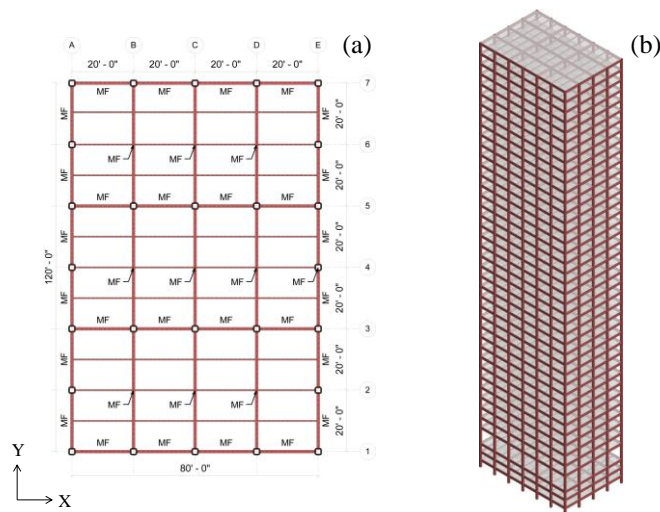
Prototype 40-storey office building plan (a) and isometric (b).
